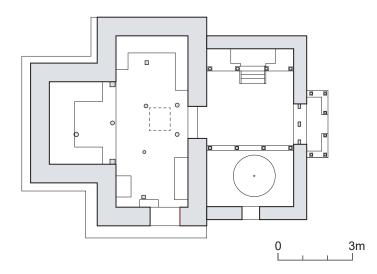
Ropa. Lotsāba Lhakhang. Ground plan.
